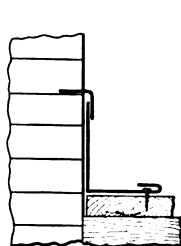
Strip of Tin Bent Over Roof Tin.
